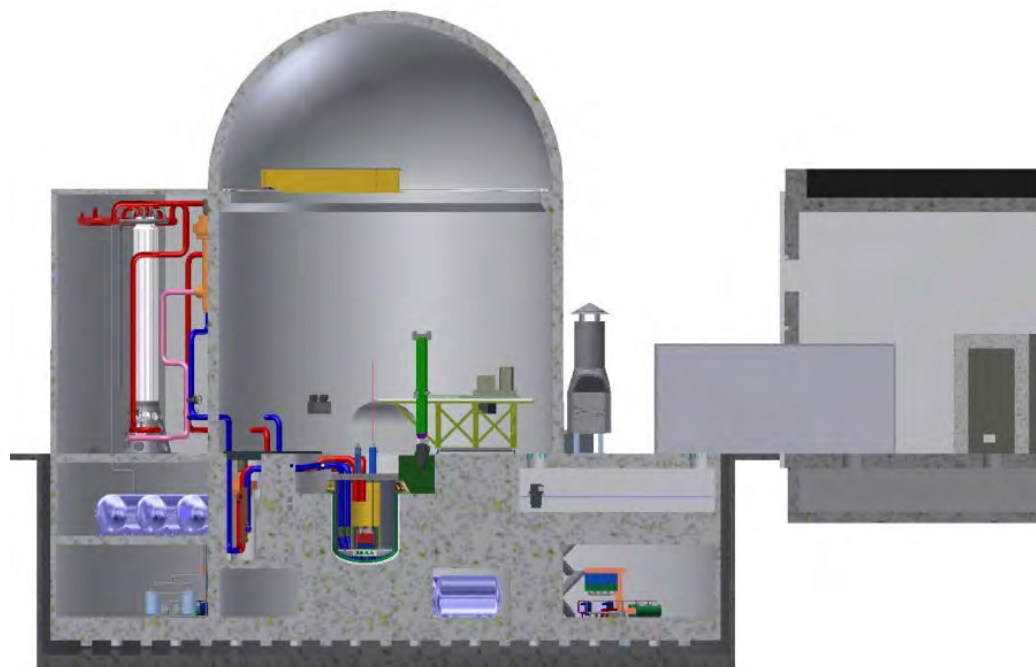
Elevation View – Showing Fuel Transfer Tunnel
